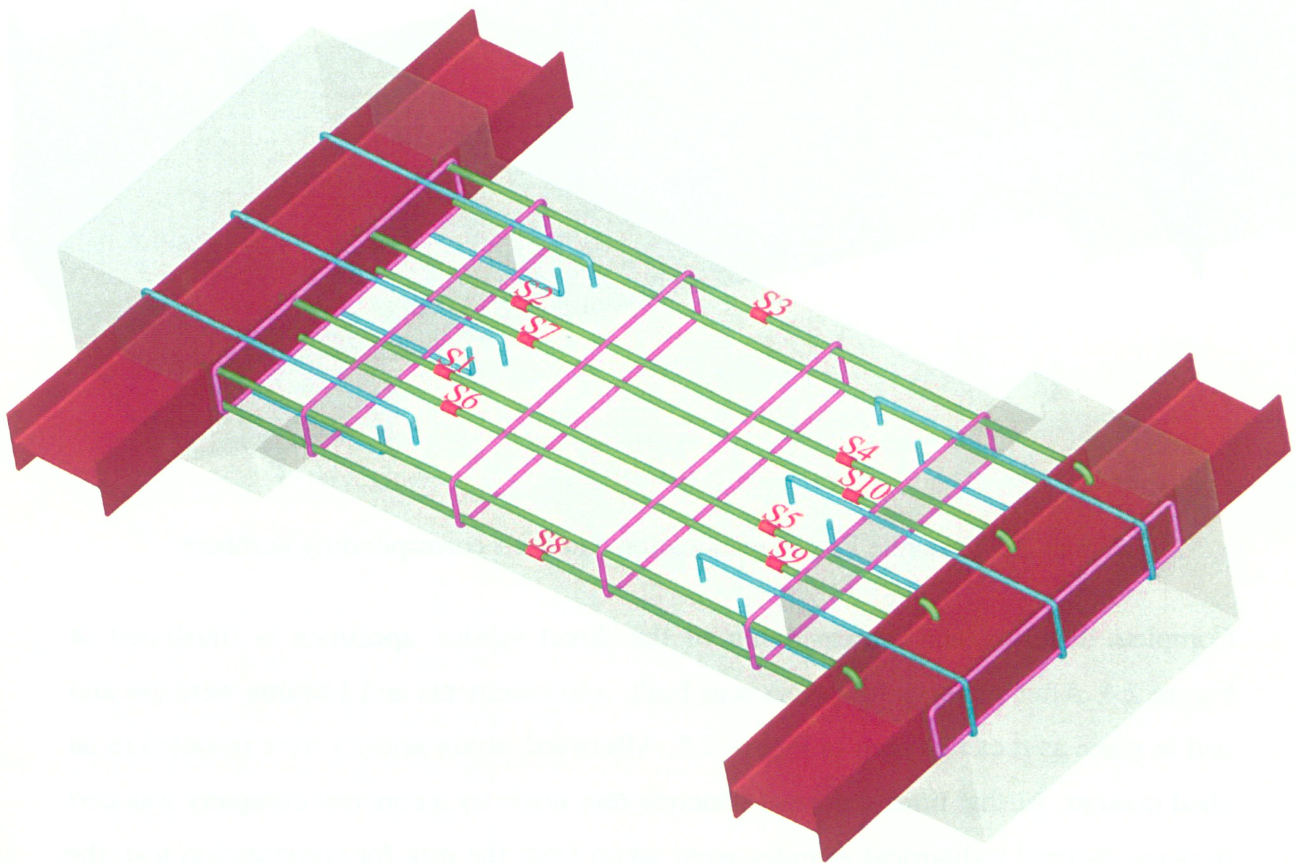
Reinforcement layout in direct tension specimen, strain sensors location and their corresponding numbers
